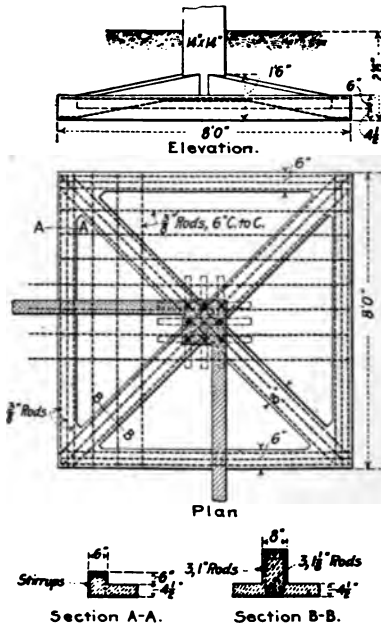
Column Footing for Retaining Wall, Atlanta Terminal Station.
